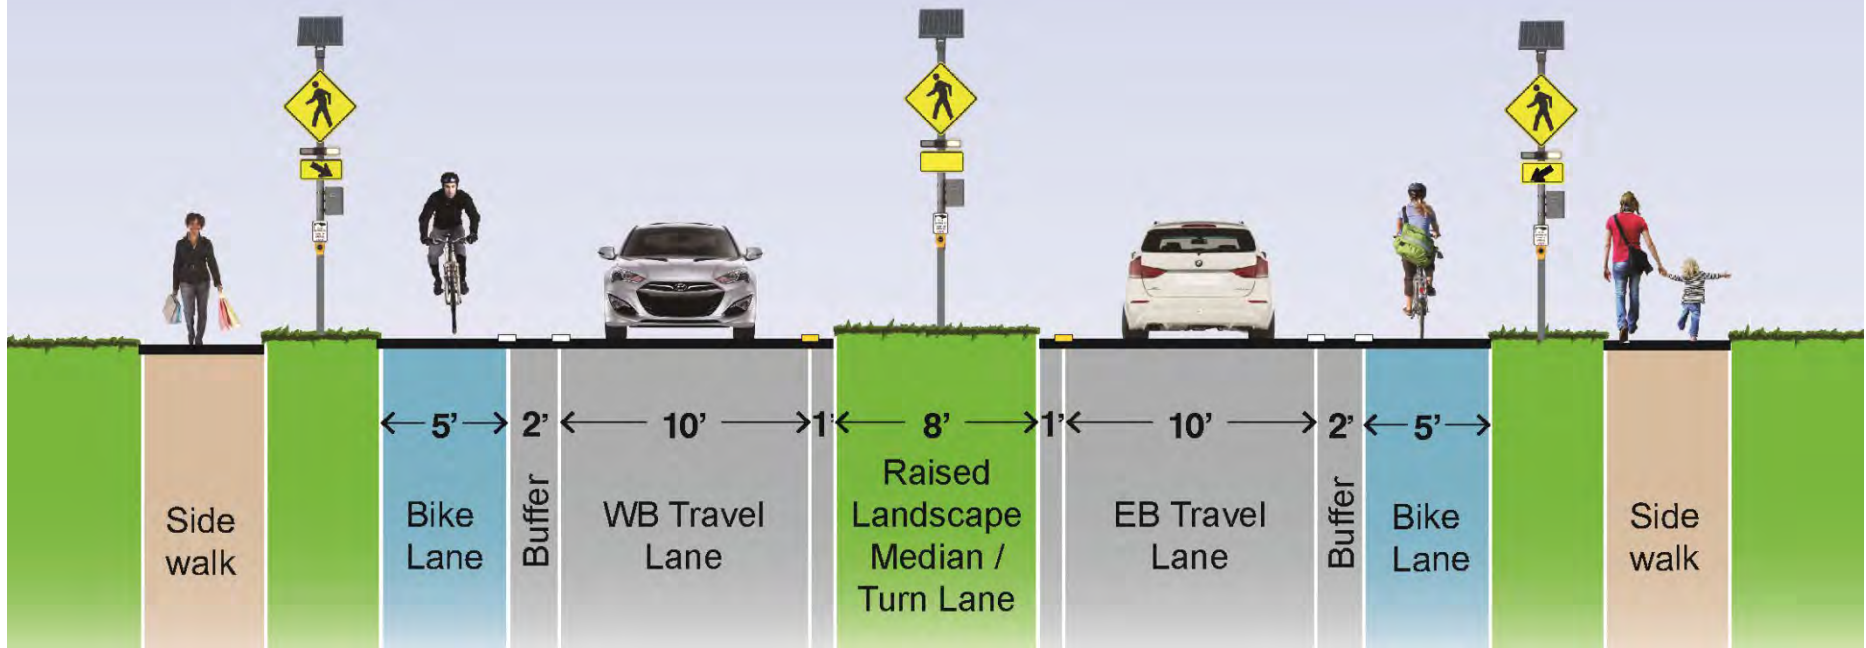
Sedgwick Road Cross Section, Scarsdale Road to Fairlee Road
